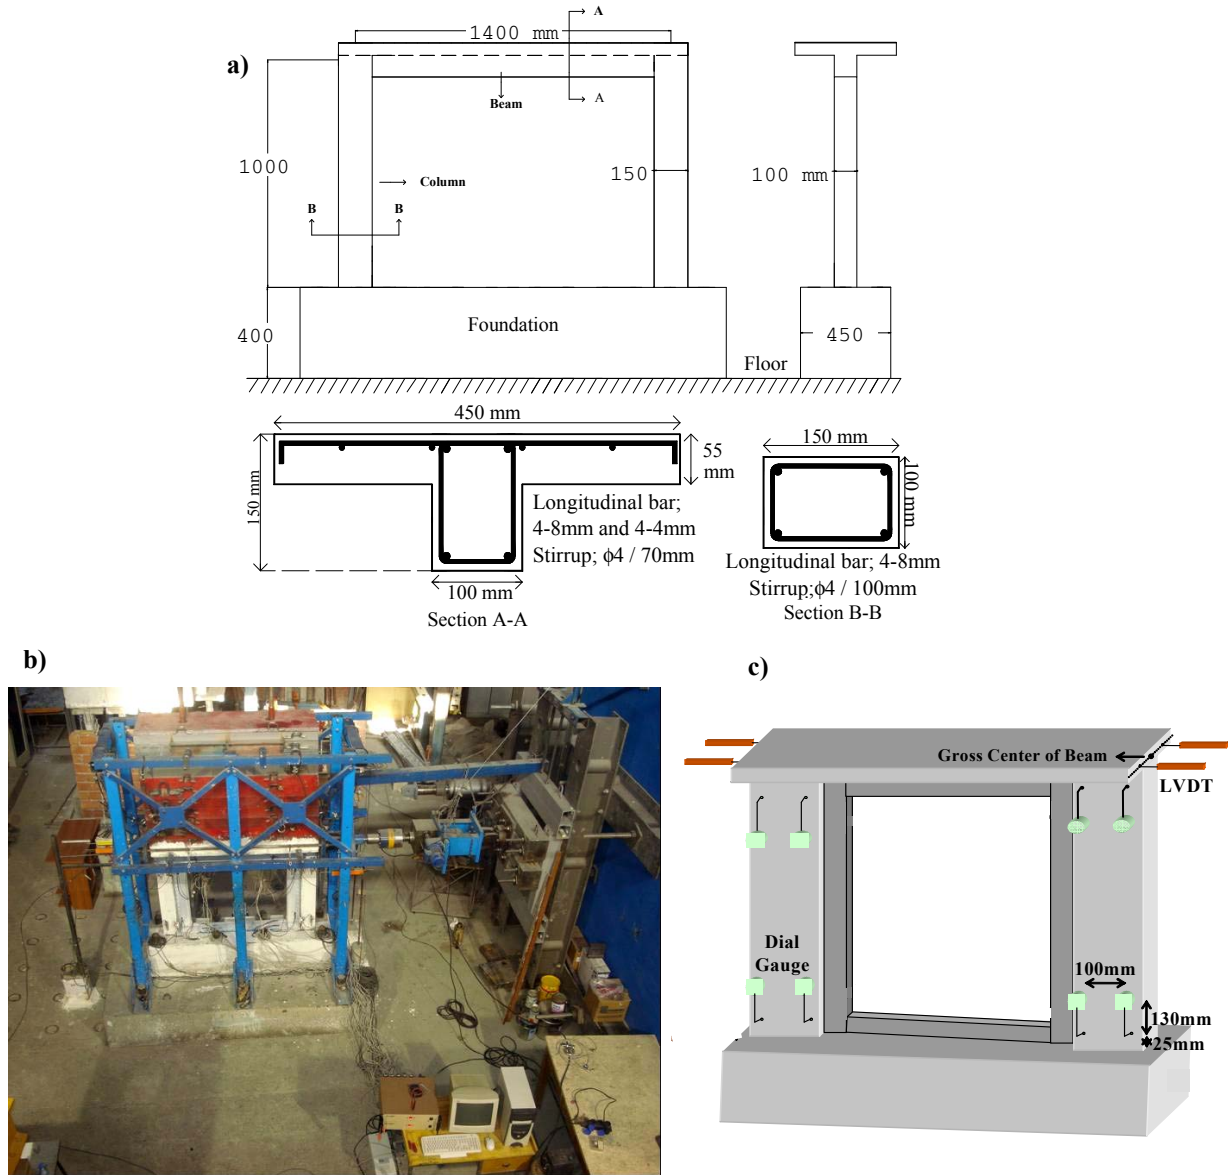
Specimen and test setup; (a) Dimensions of specimen; (b) Test setup; (c) Instrumentation scheme
